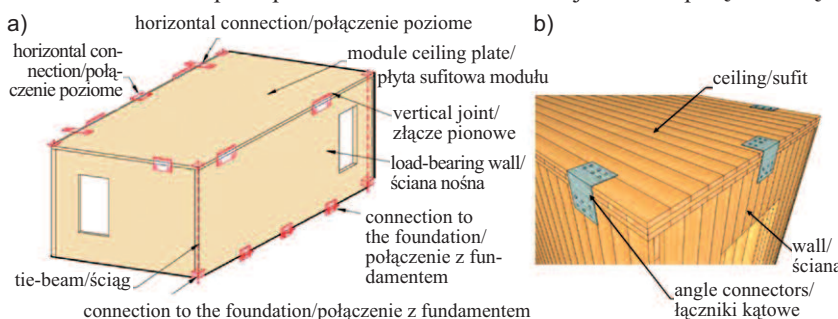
Drawing of the module components in the slab system: a) module components [23]; b) connection of wall and ceiling elements
